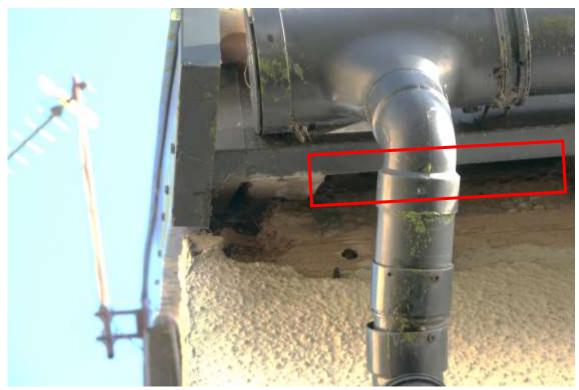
, gaps at eaves highlighted in red on the west aspect of building one.
